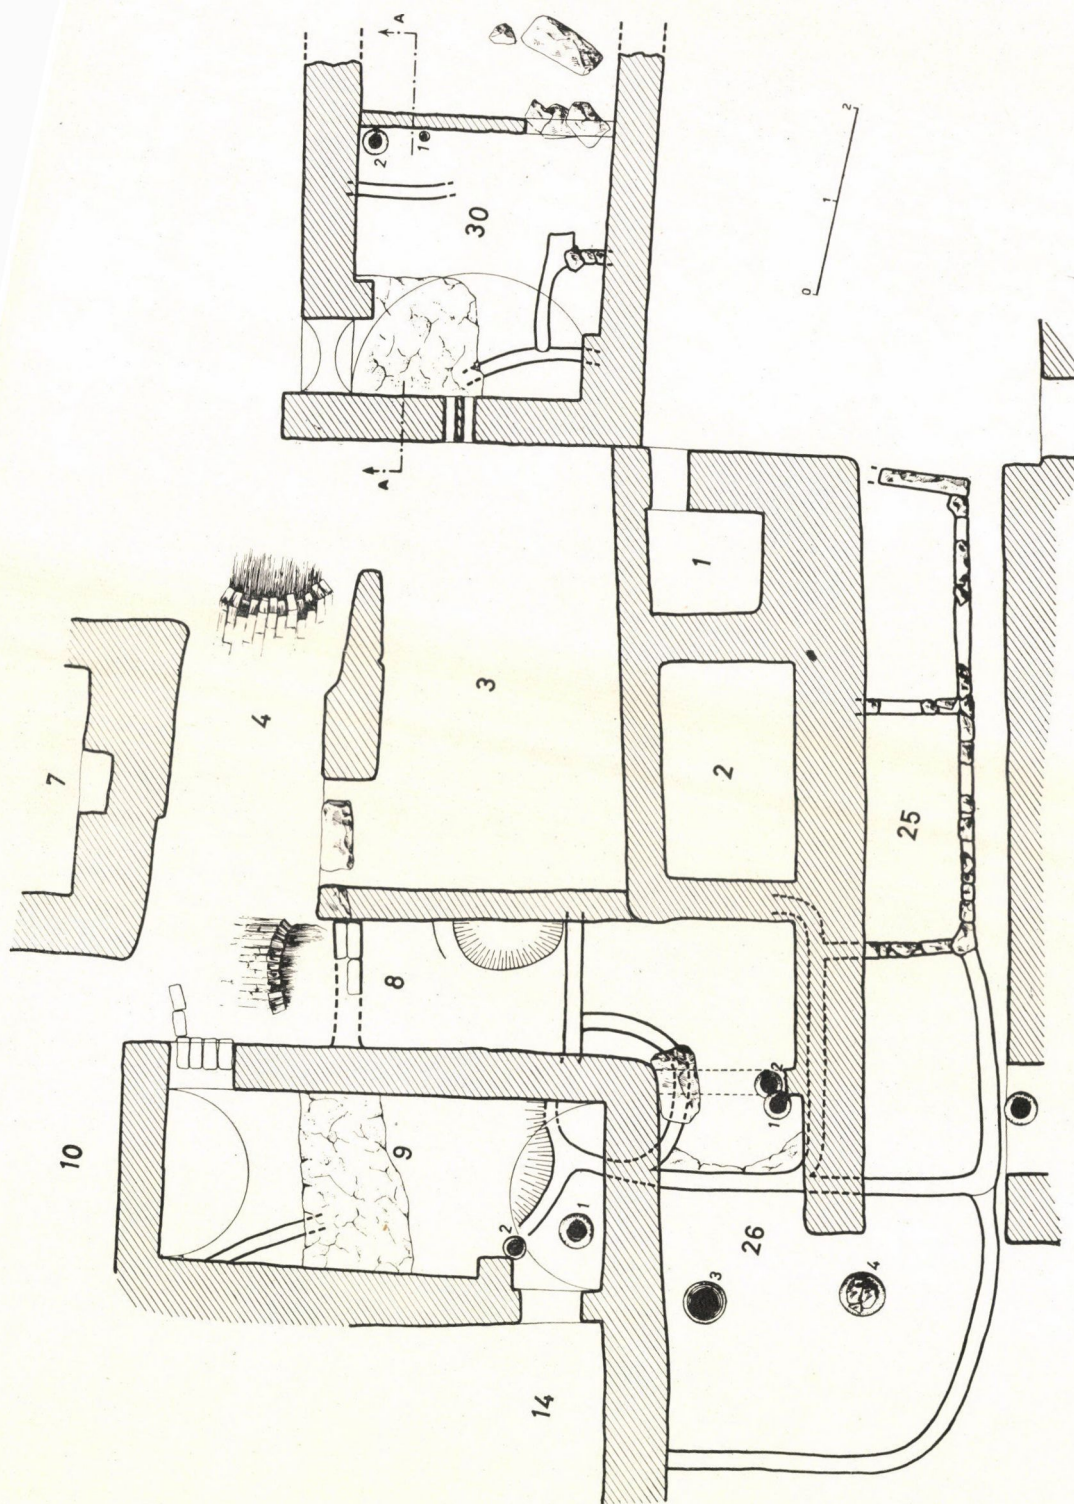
C/I, ground-plan of rooms Nos 25, 26, 8, 1, 2, 3, 4 and 30
